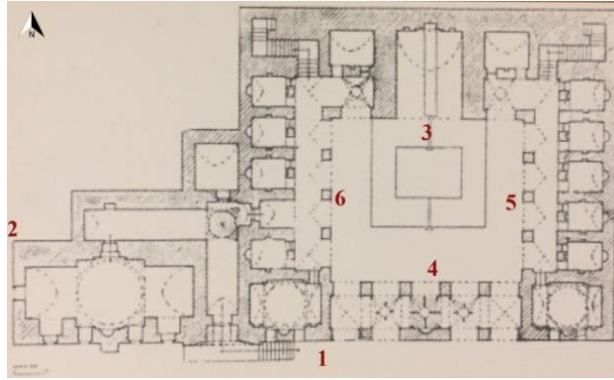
Ground floor plan and wall numbers (Karataş, 2016)
